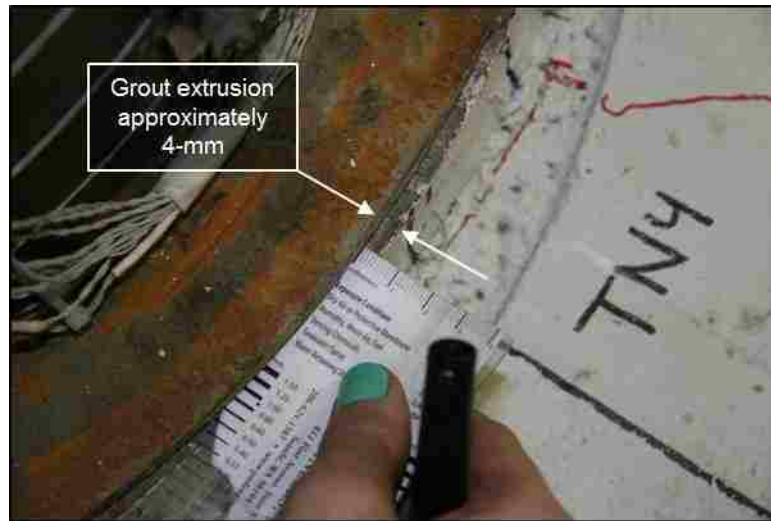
WRC South grout pad cracking at 3.43% drift North
